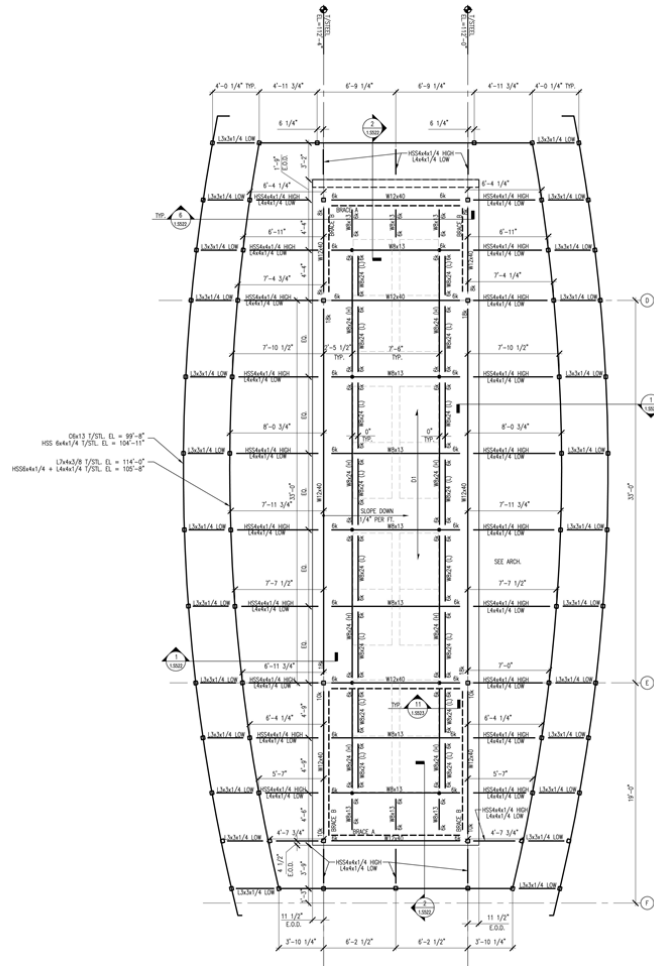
Lantern Framing Plan, larger plan found in Appendix A
